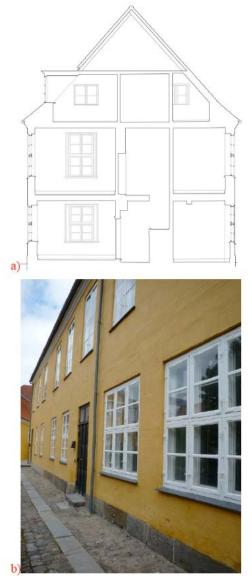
The half-timbered building. a) The structural section, b) a photo of the half-timbered building after renovation.
